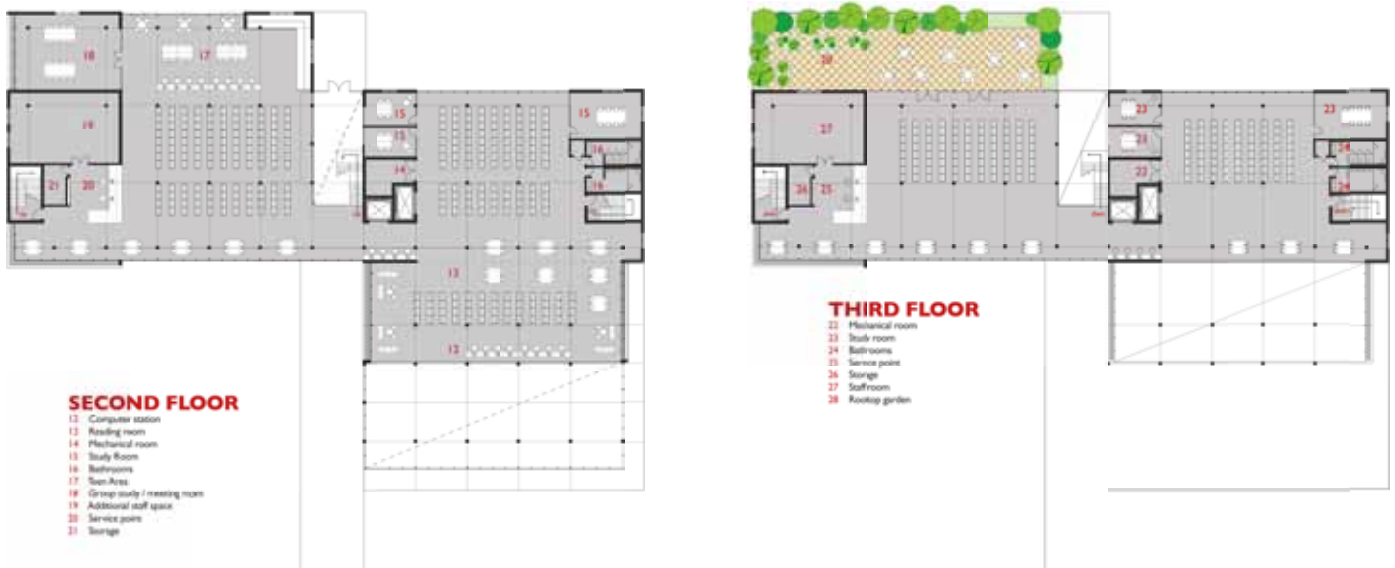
and 72: Second floor plant (left), third floor plan (right) (Jennifer Huang).
